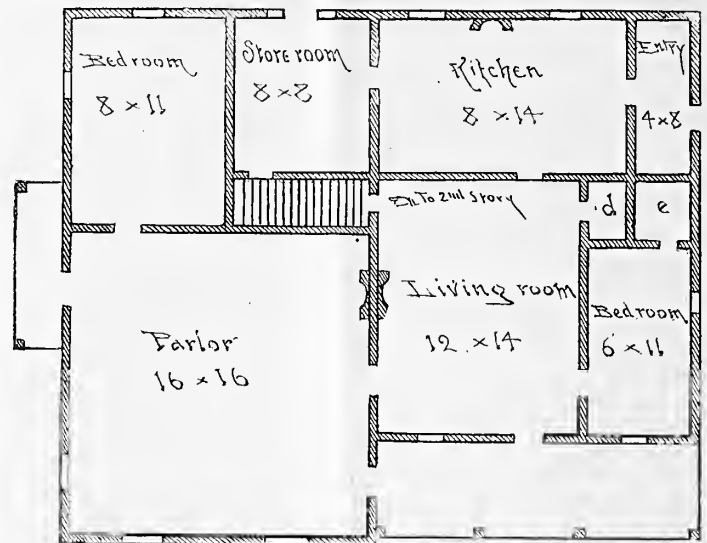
GROUND PLAN OF COMPLETED HOUSE.
